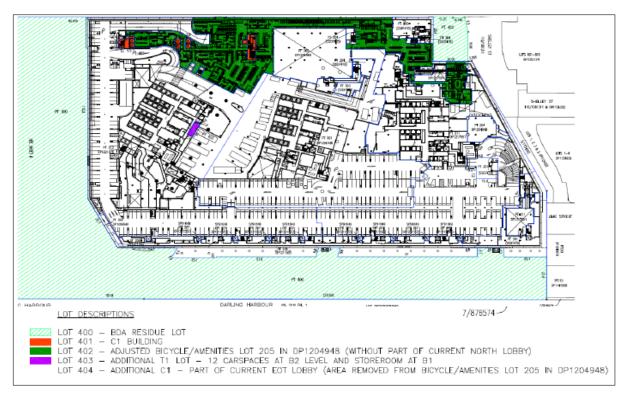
| Basement Level 1 (south) showing proposed Lot 401 (red shading), proposed Lot 402 (green shading), proposed lot 403 (purple shading) and proposed Lot 400 (green hatching) (Source: Applicant)
